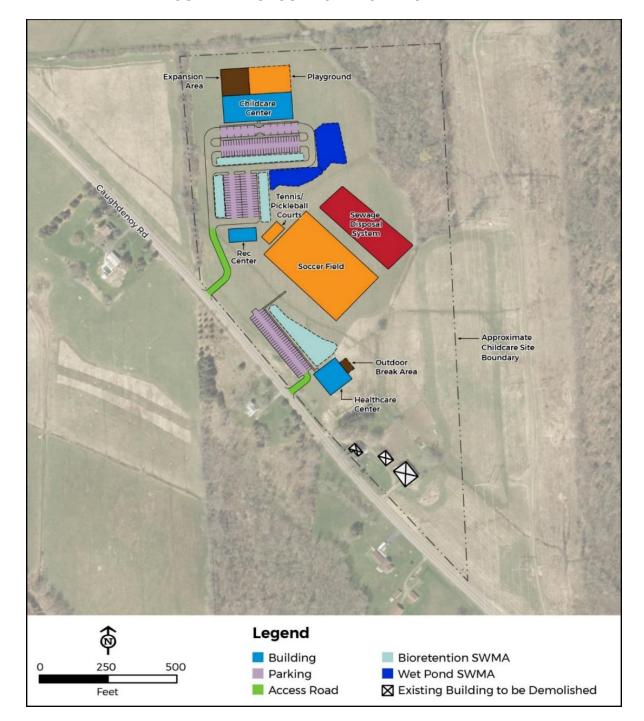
PROPOSED CHILDCARE SITE PLAN
